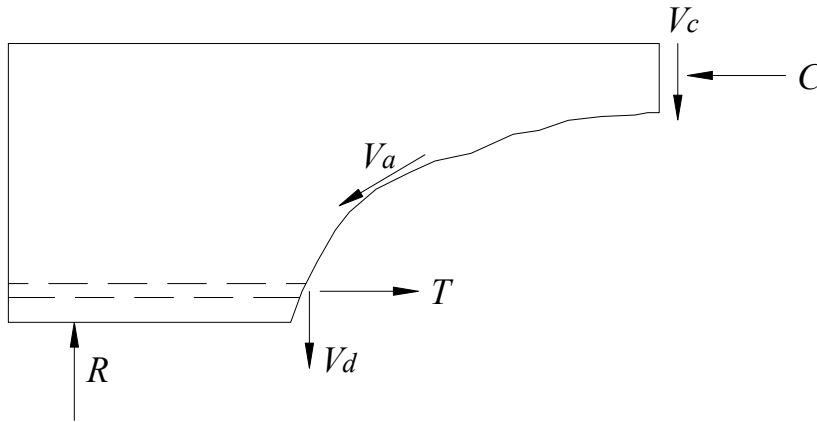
Internal forces in the beam OA-3 failing in shear.
